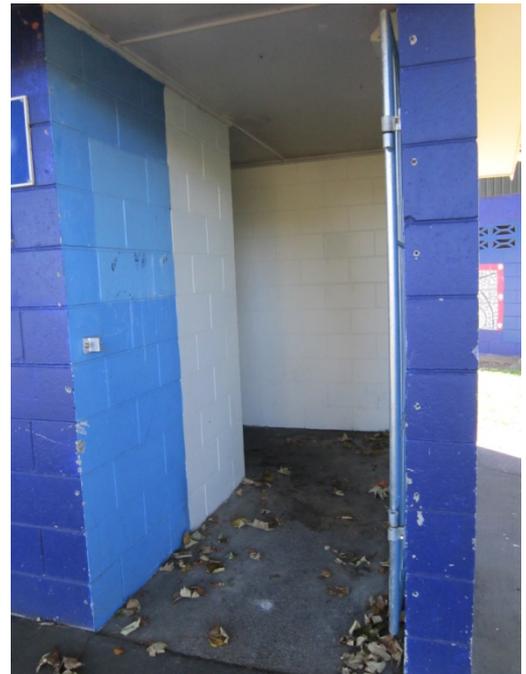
View of the mens toilet entrance block walls at either side of the opening
